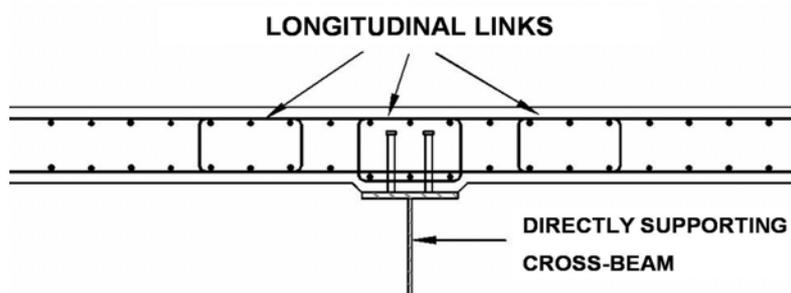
Longitudinal links required near to a directly supporting cross-beam
